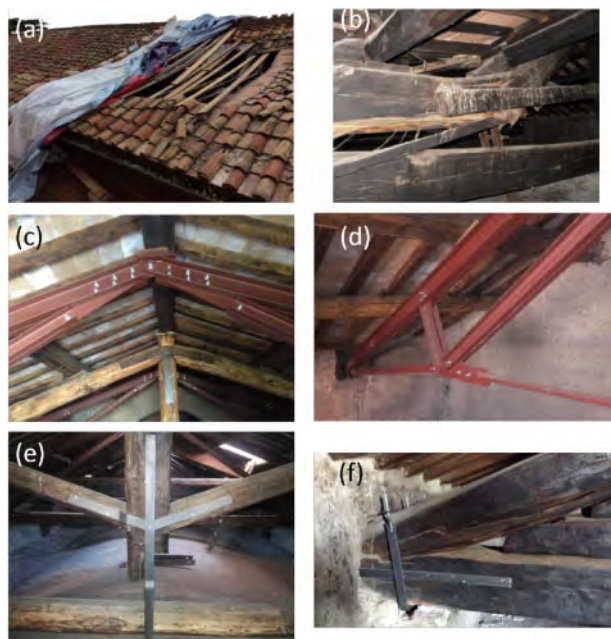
(a) Damage to the roof of the church in 2018, (b) damaged wooden truss in 2018, (c), overview of the restoration performed to 14 wooden trusses, (d) detail of a new steel truss used to substituted an older wooden truss, (e) and (f) details of the restoration of wooden trusses with steel elements.
